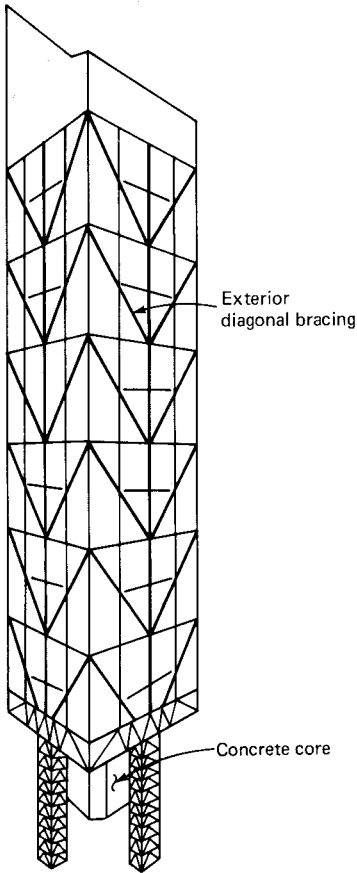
Schematic framing of CitiCorp Center, New York (Structural engineers, Le Messurier Associates).
